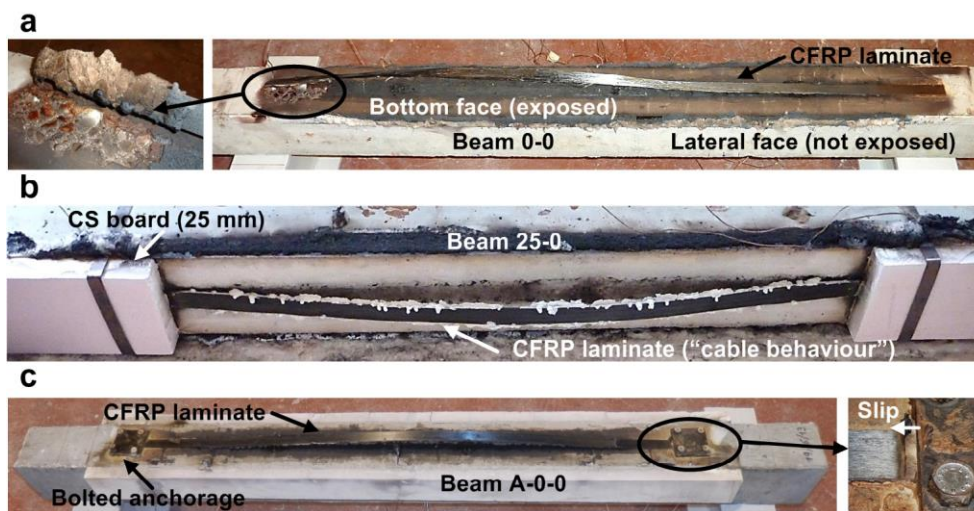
Examples of the failure modes of the CFRP strengthening system: (a) beam 0-0; (b) beam 25-0; (c) beam A-0-0 [57]
